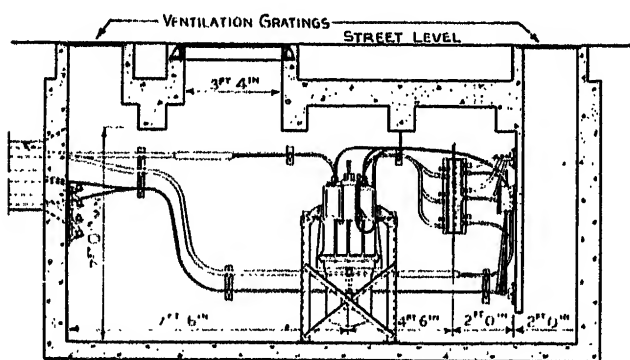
SECTIONAL ELEVATION OF TRANSFORMER VAULT SHOWING OIL CIRCUIT BREAKER, JUNCTION BOXES, AND ARRANGEMENT FOR VENTILATION
